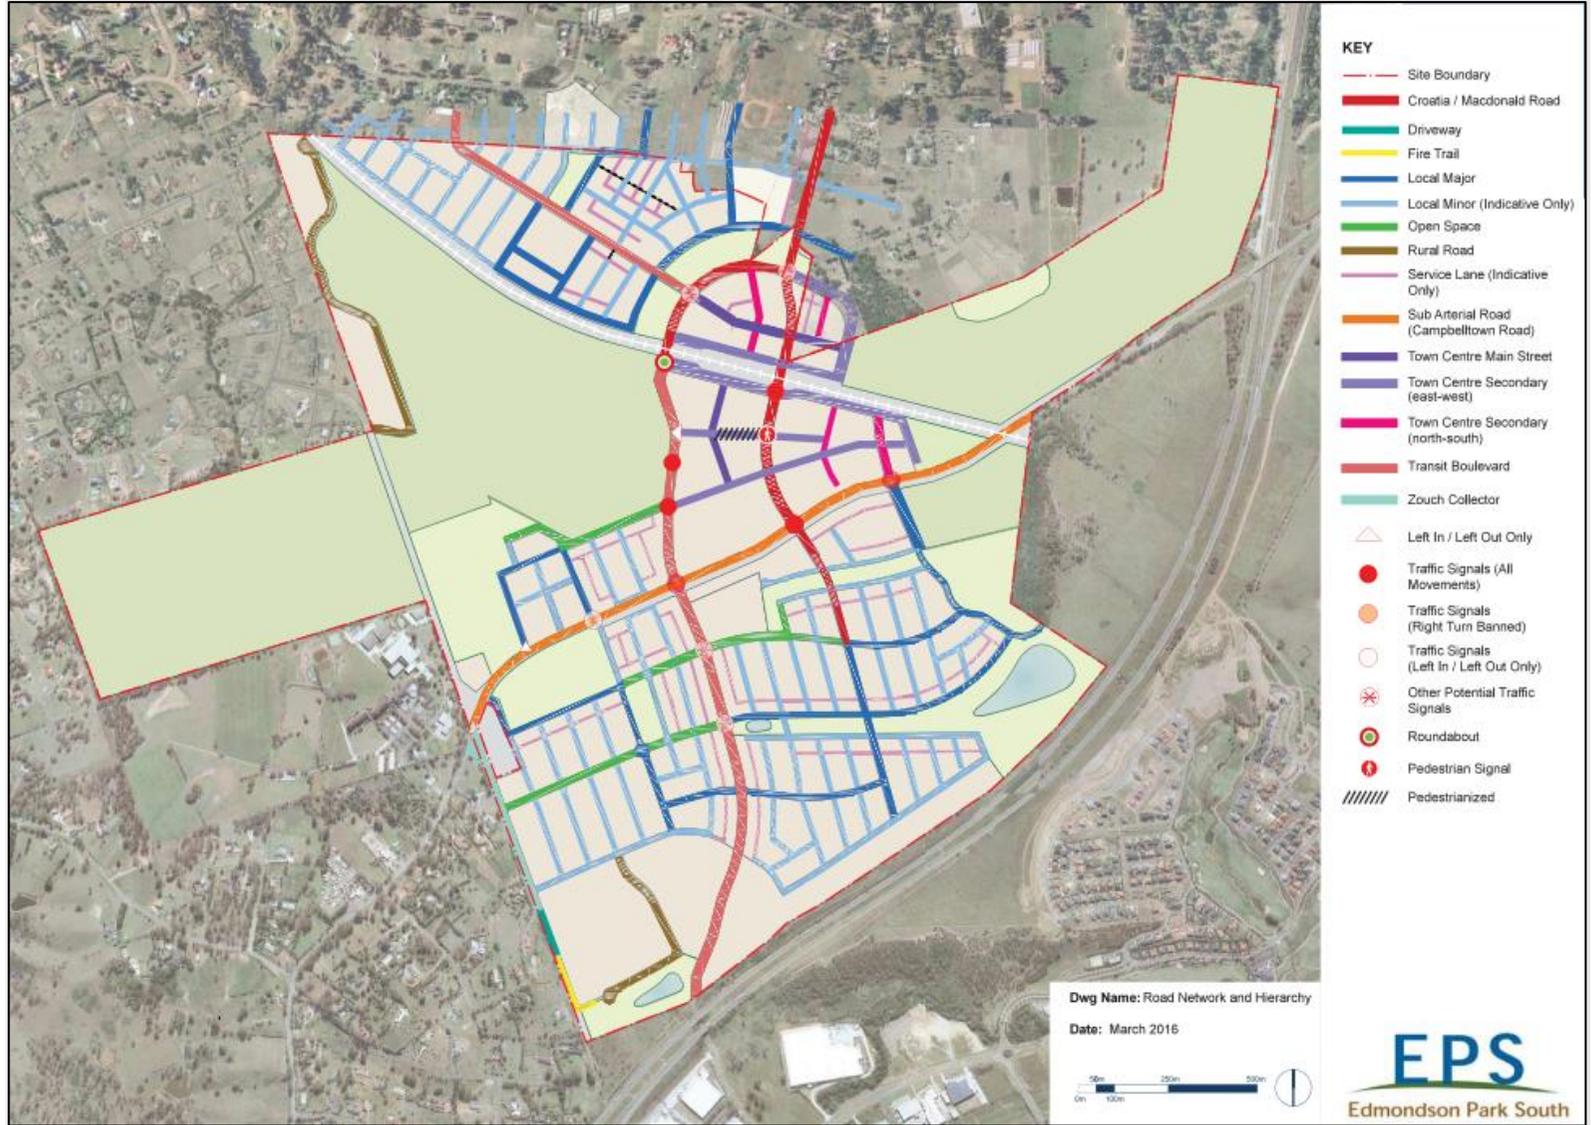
Planned road network under the Edmondson Park South Concept Plan (Fraser's Property 2018).
